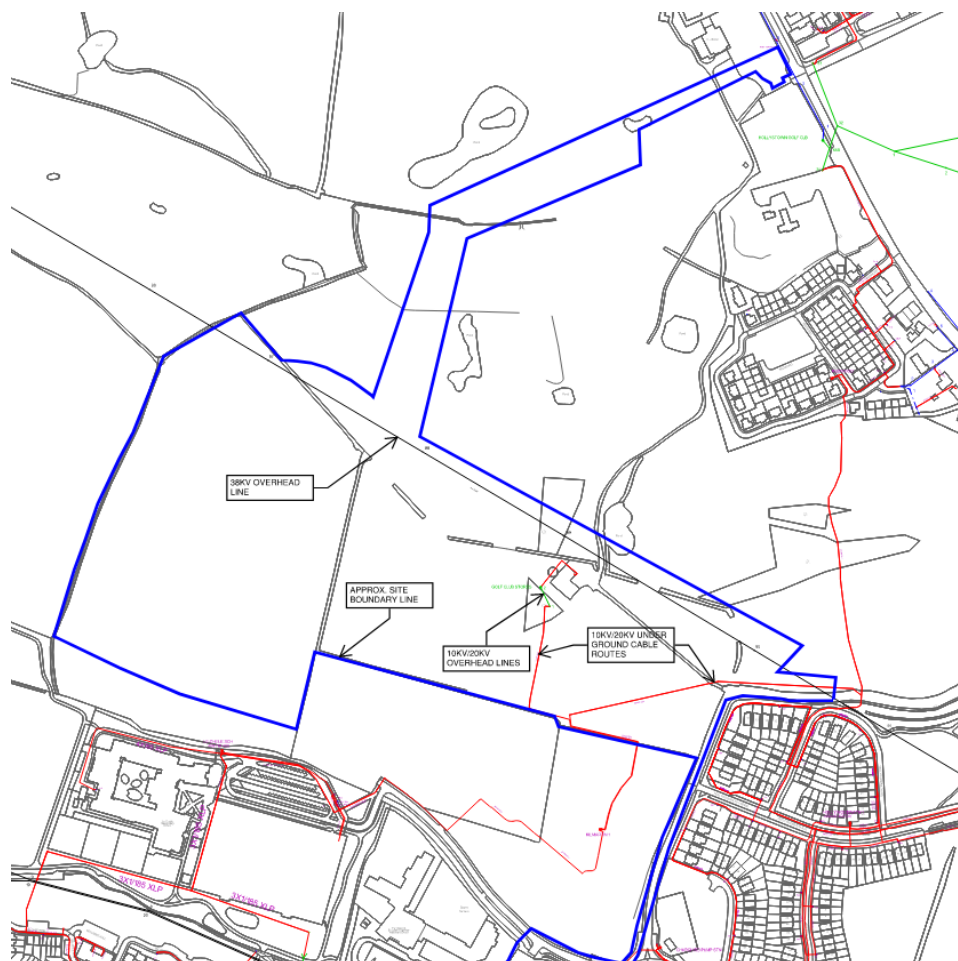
ESB Networks Map of Hollystown Site Surrounds
